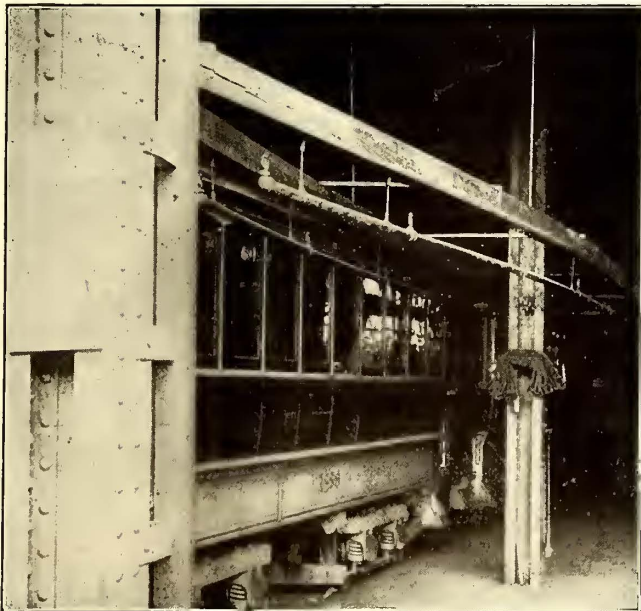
Arrangement for Supporting Aisle Sprinklers by Attaching 4-in. x 6-in. Timbers to Sides of Posts
